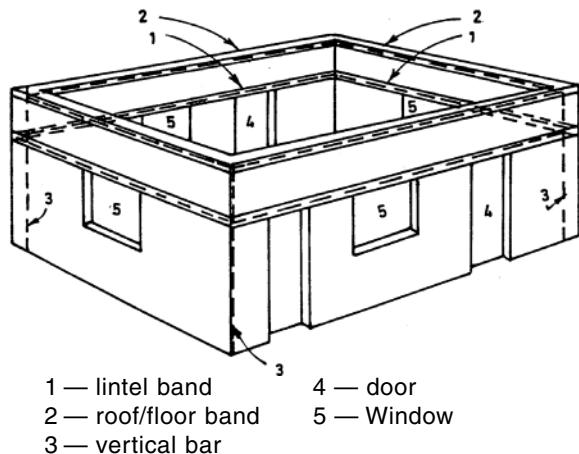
OVERALL ARRANGEMENT OF REINFORCING LOW STRENGTH MASONRY BUILDINGS
